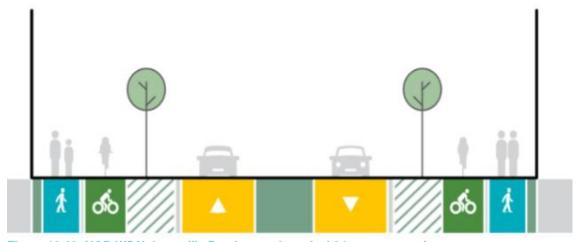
NOR W5 Hobsonville Road upgrade typical 24 m cross section
